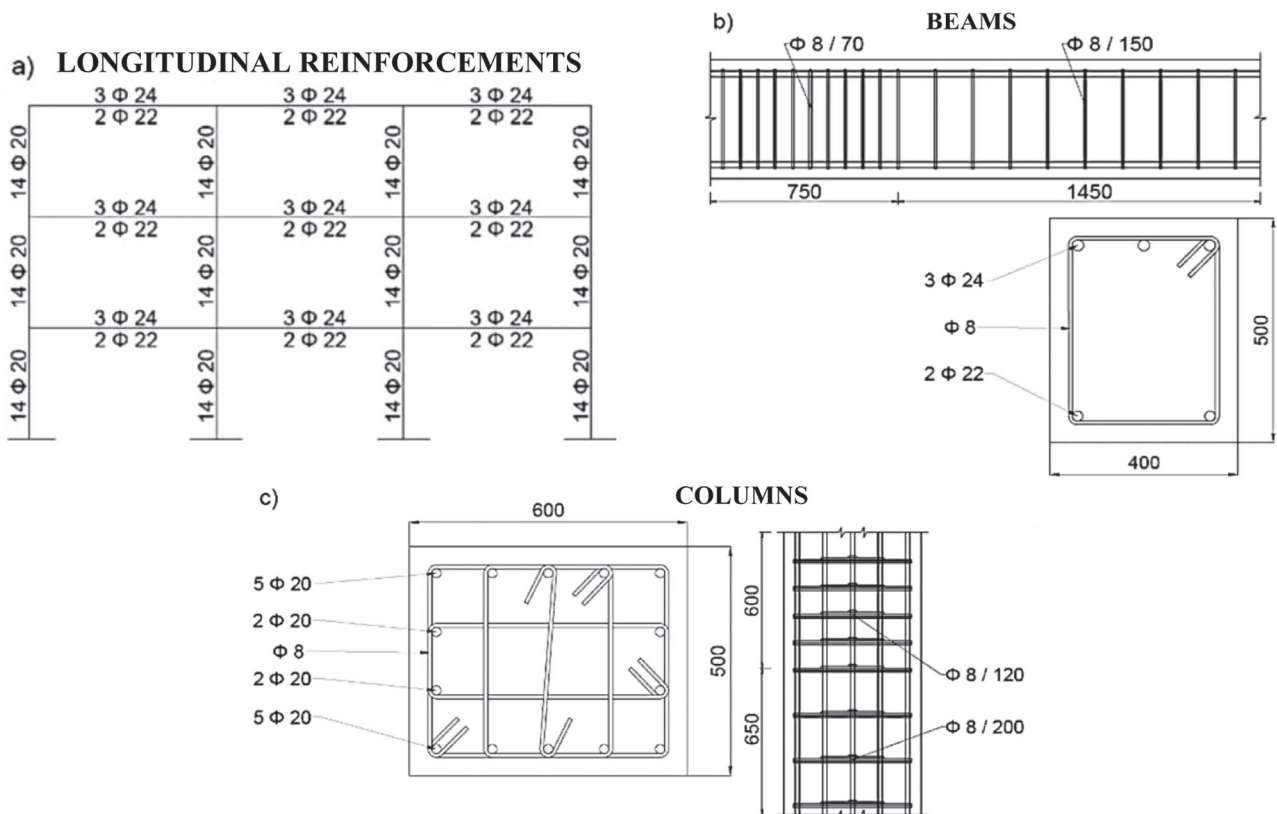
Standard seismic design: a) layout of the longitudinal reinforcement rebars of the RC MR frame, b) stirrups with the cross-section of the beams and c) stirrups and legs with the cross-section of the columns. Measurements in millimetres.
